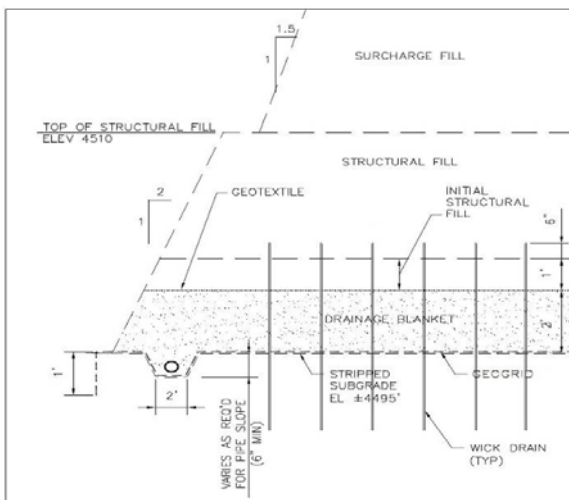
Drainage Blanket and Wick Drain Installation Details
